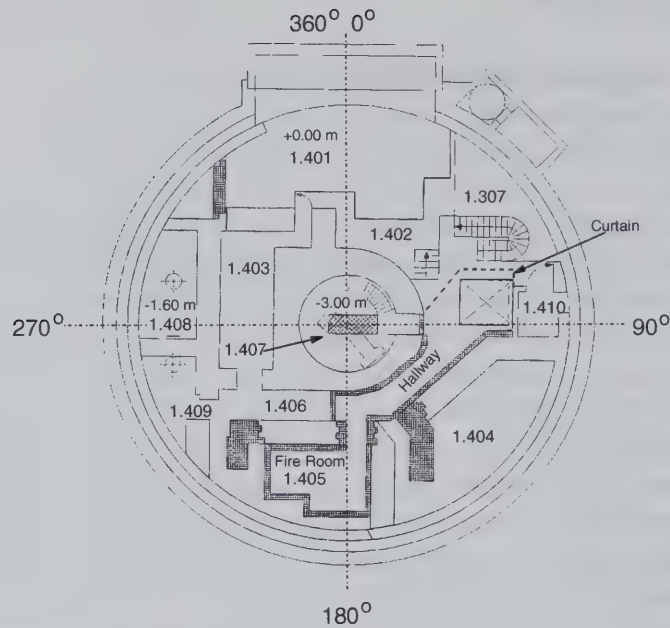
Fire Floor at Level 1.400 for T51 Wood Crib Tests
